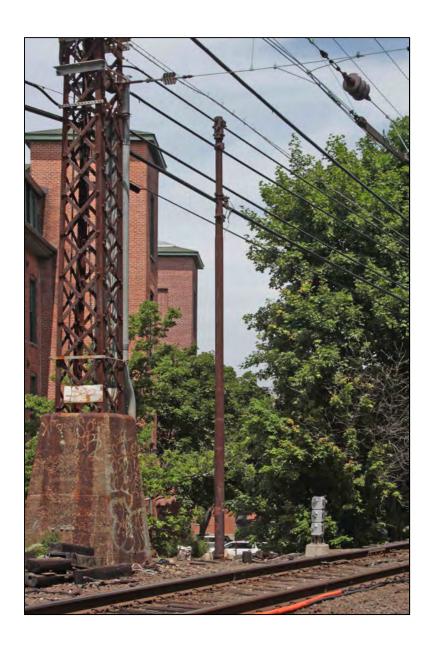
Detail of typical H-column footing, camera facing southeast.
